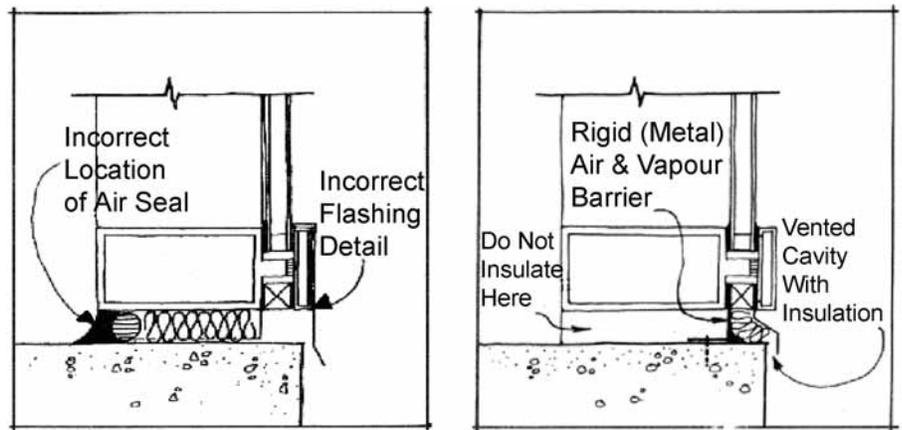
Source: R.L. Quirouette, “Glass and Metal Curtain Wall Systems”.
